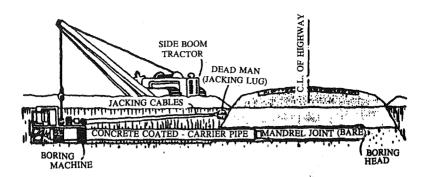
Direct installation of Carrier Pipe with Cradle-Type Auger HEB
